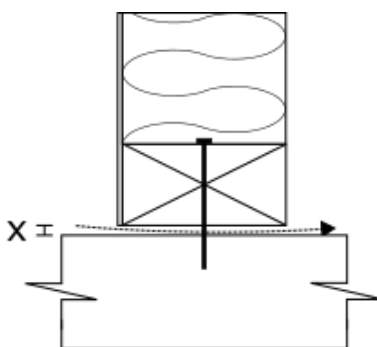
Leakage path in connection between floor joist and concrete ground slab.
